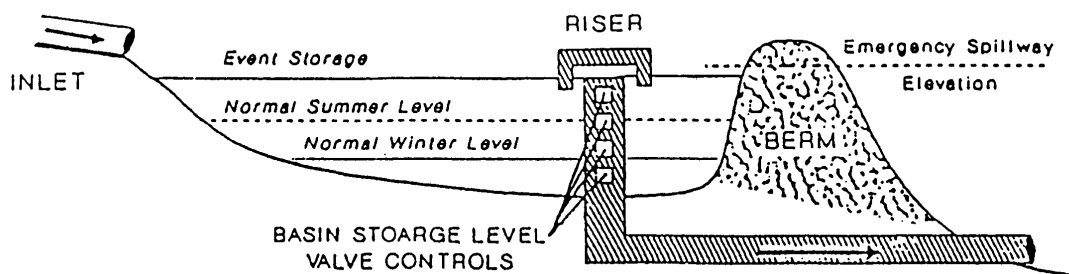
Wet detention pond outfall risers for winter conditions (Oberts 1994).
